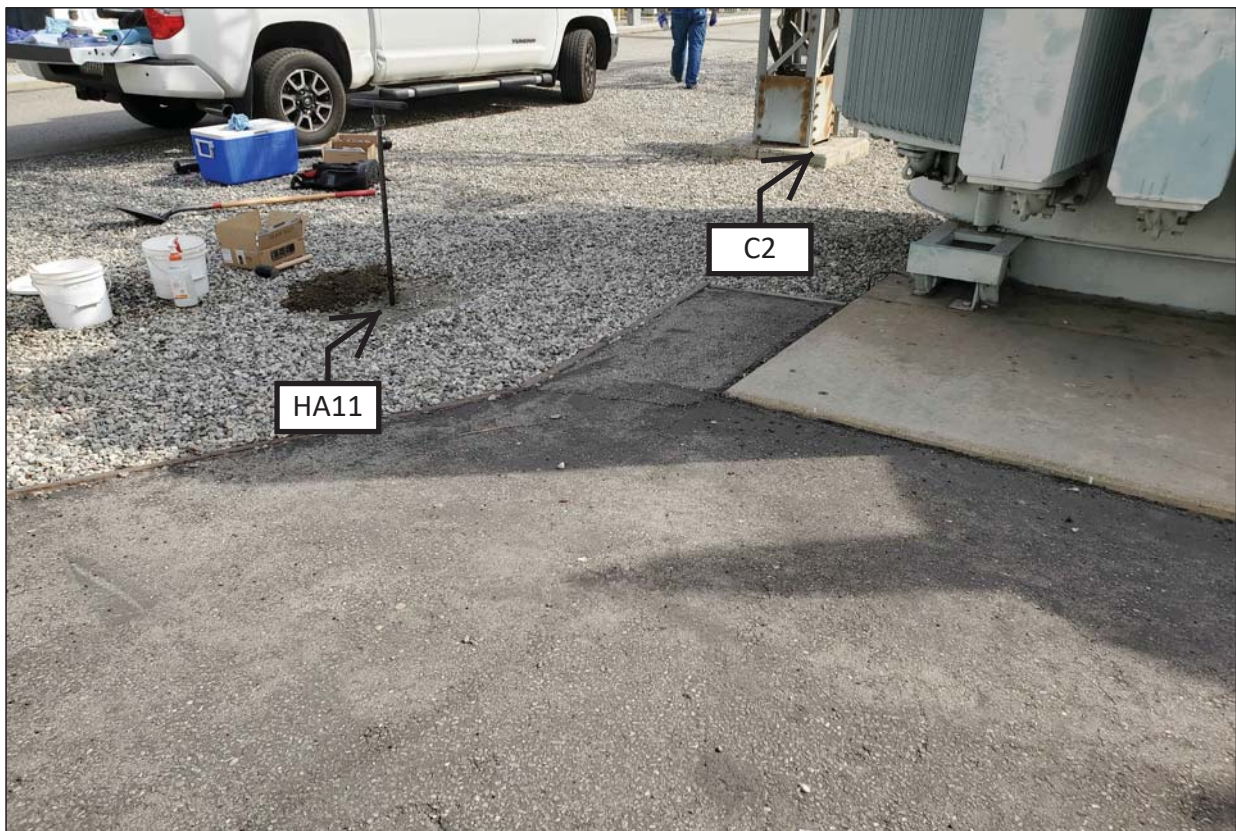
HAND AUGER LOCATION HA11 AND COMPOSITE CONCRETE SAMPLE LOCATION C2
